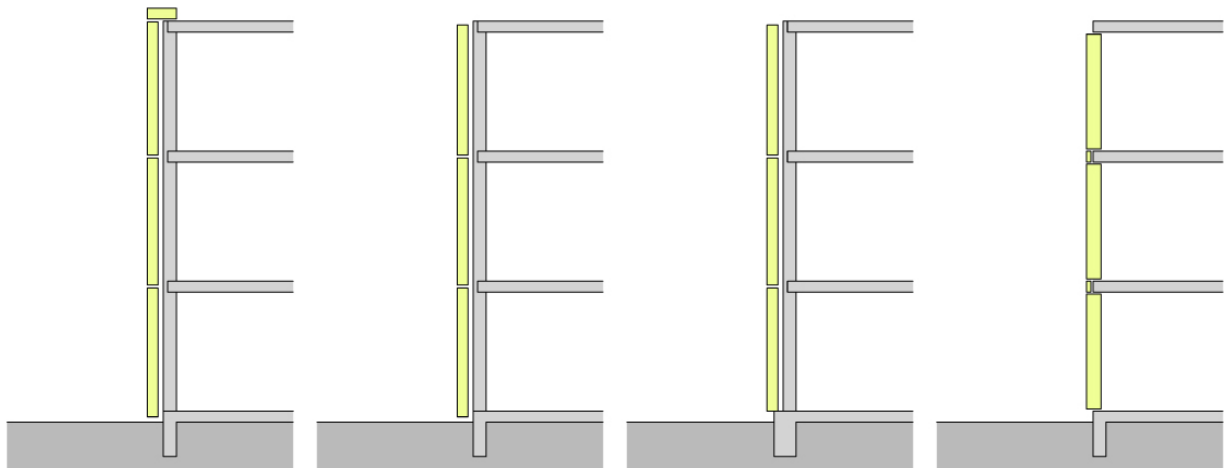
Mounting typology a) hanging, b) storey wise mounted, c) standing, d) storey wise
